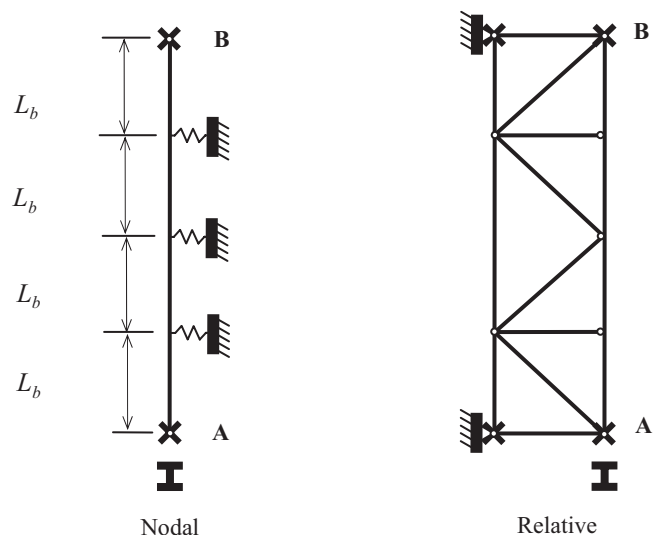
Plan view of beam AB with compression flange lateral brace.
